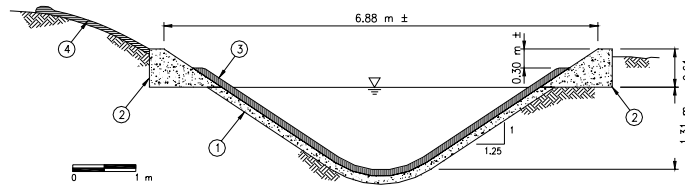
High Speed Channel cross-section. ① Original 1912 channel with 12.7 cm thick unreinforced concrete, ② 1969 unreinforced concrete channel enlargement, ③ 7.6 cm thick wire mesh reinforced concrete gunite overly for post-1971 earthquake repair, and ④ 7.6 cm gunite 1972 drainage improvement.
